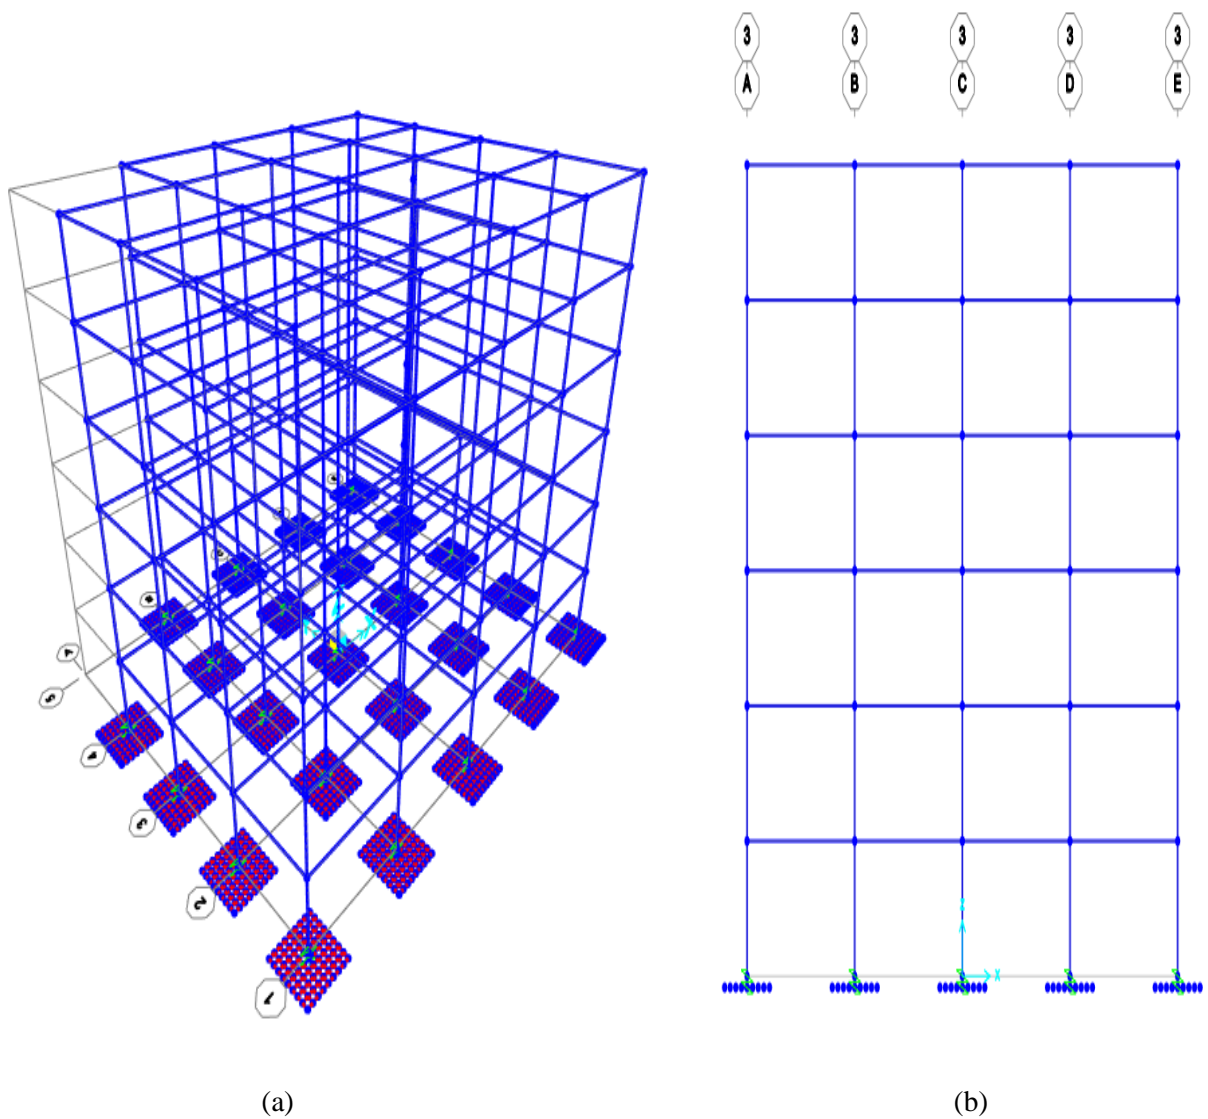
Building with flexible base modeled in SAP2000 : (a) 3D view and (b)Elevation
